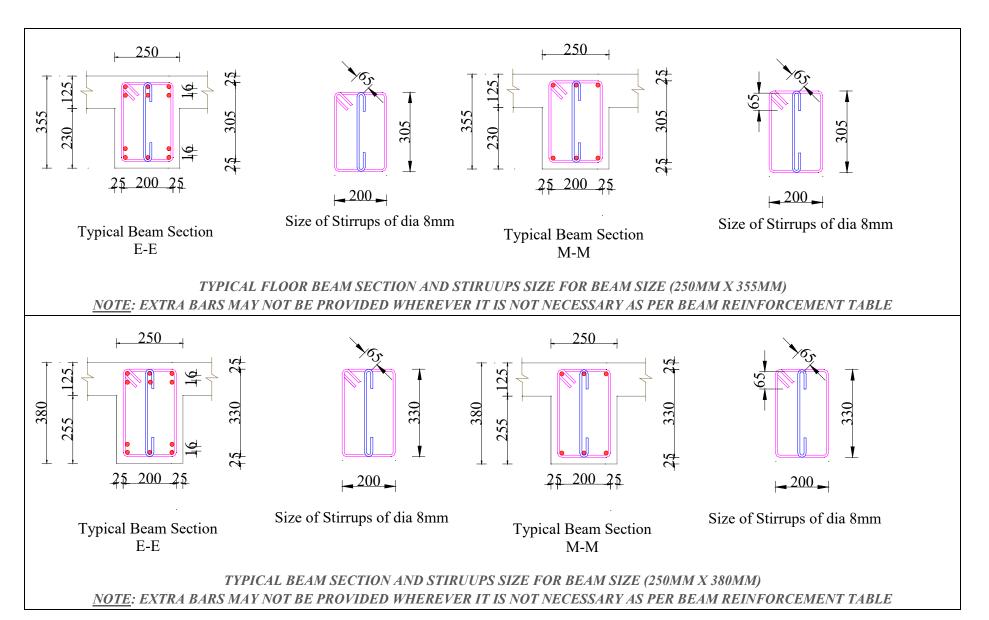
REINFORCEMENT DISTRIBUTION IN FLOOR BEAM OF THREE STOREY BUILDING
